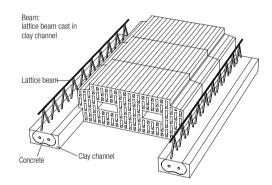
Fitting the individual Hourdis-type elements between the reinforced concrete beams
